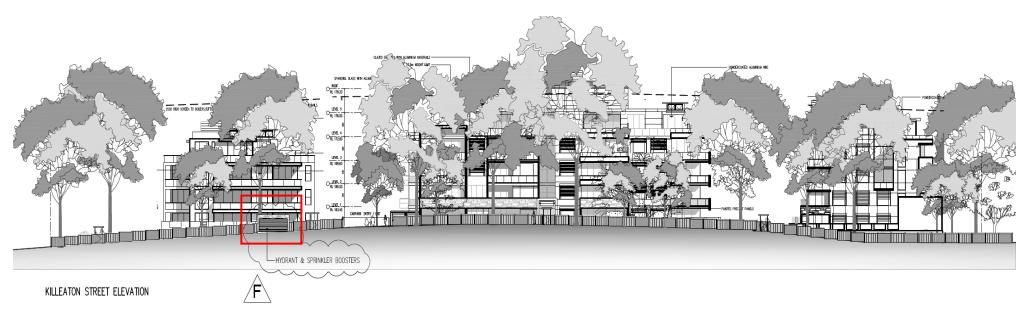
View from Killeaton Street of Proposed Cabinet for Fire Hydrant and Sprinkler Booster Valves
